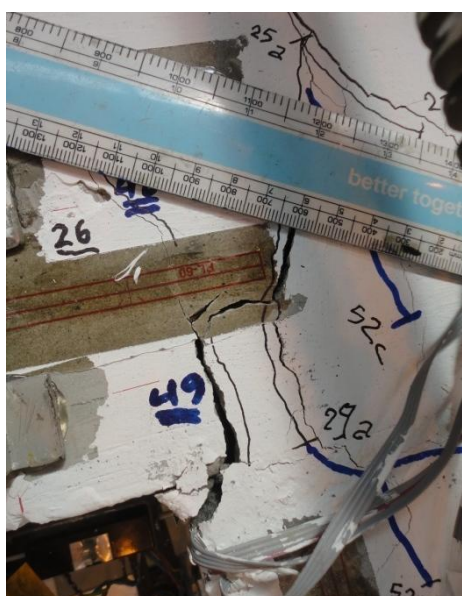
Failure mode in specimen SW2 (at the end of loading stage 4)
